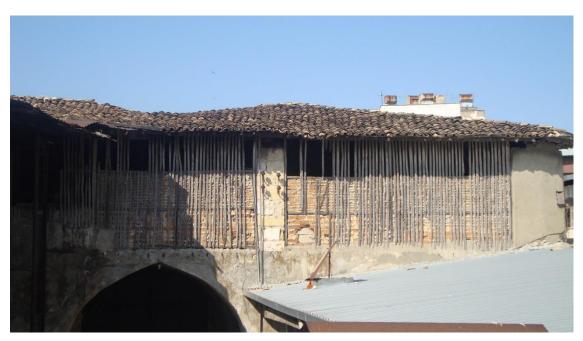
The original wooden screen and later added low partition brick masonry walls between the original cut stone masonry columns on the south part of the drying area
